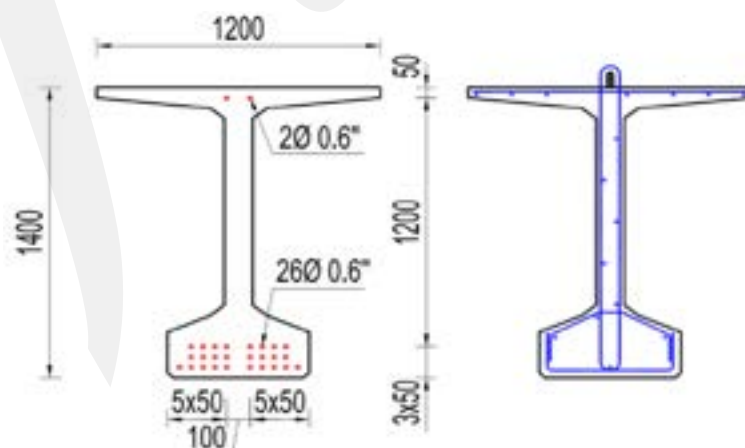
Cross section of the I-girders showing typical reinforcement and location of the strands.
